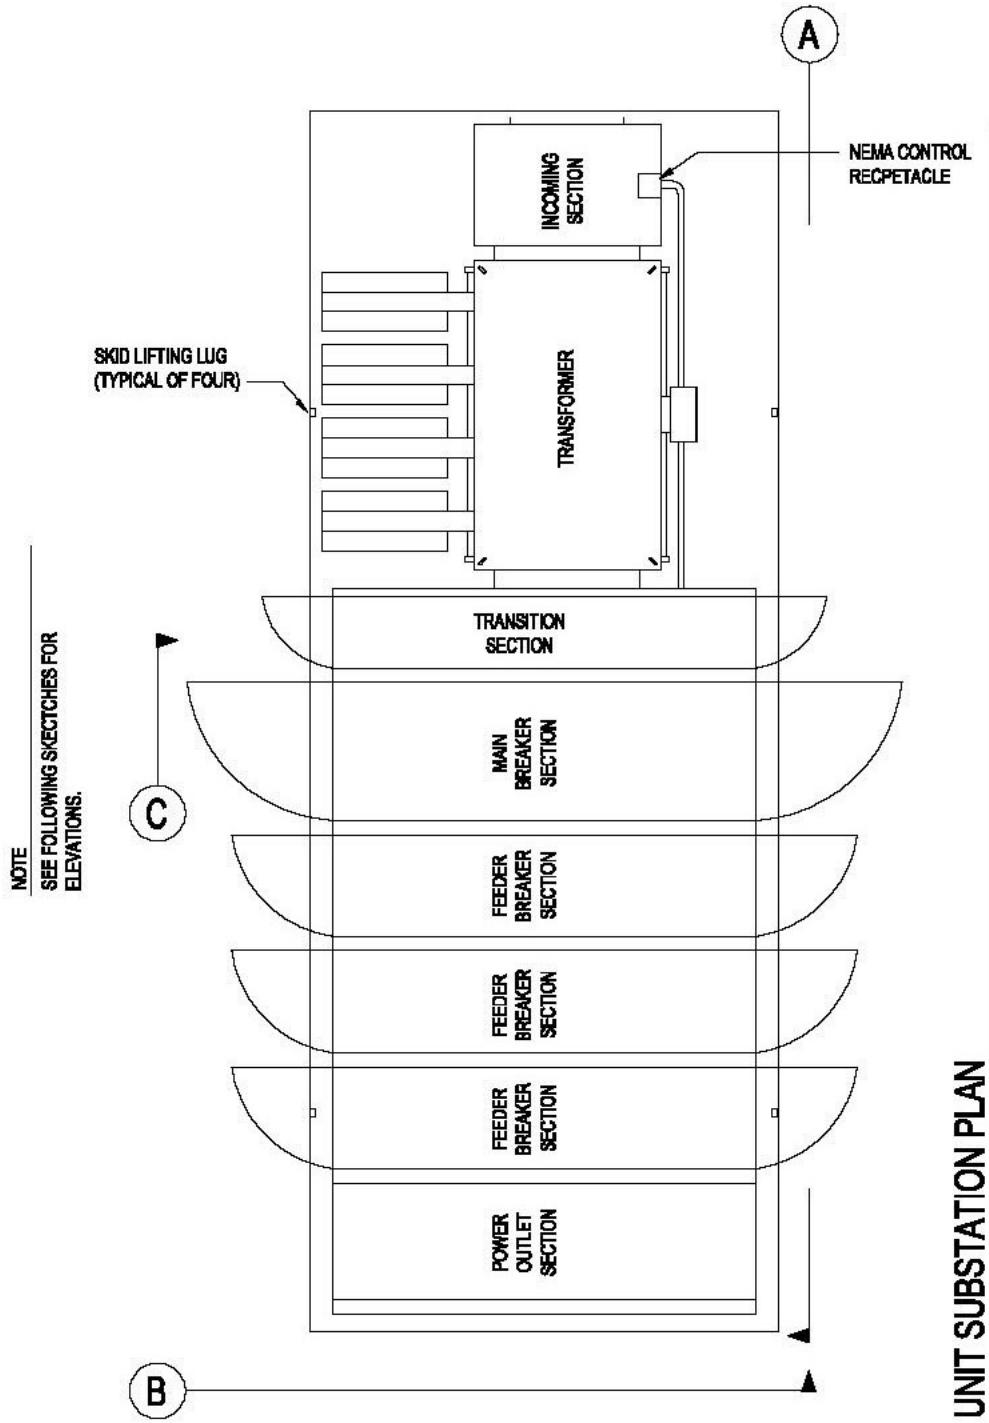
E (Electrical System for a Double-Deck Pier (5 of 9)
